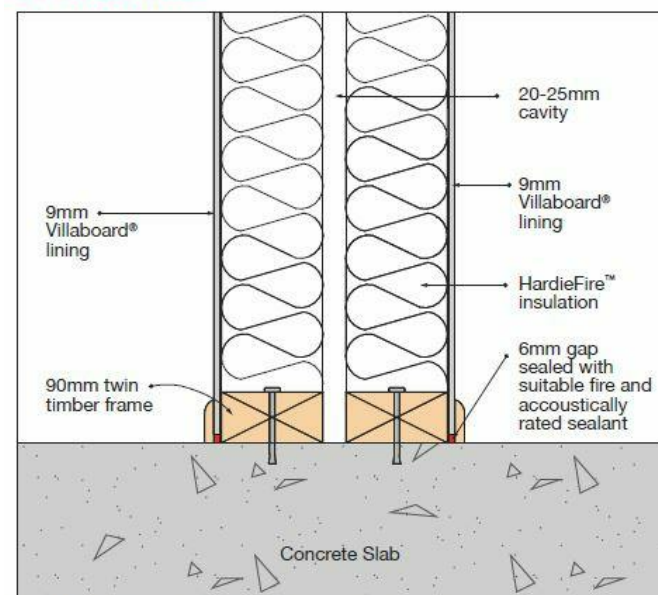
HARDIESMART™ INTERTENANCY WALL SYSTEM BASE TO SLAB
